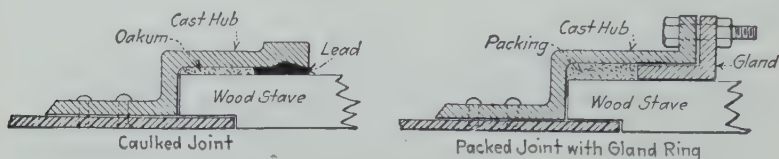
Methods of connecting steel and wood-stave pipes.
